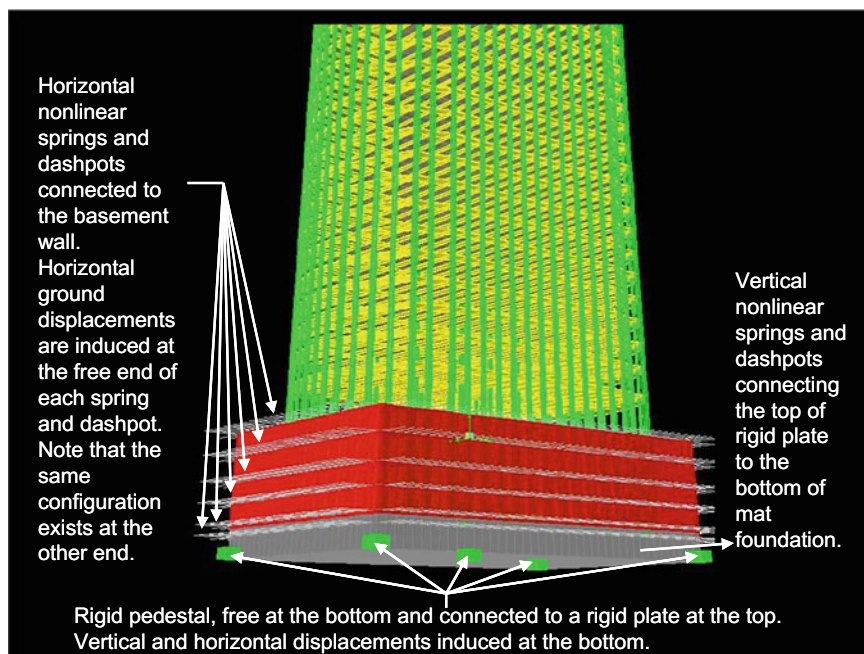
A soil-foundation-structure interaction modeling technique for tall buildings with subterranean floors
